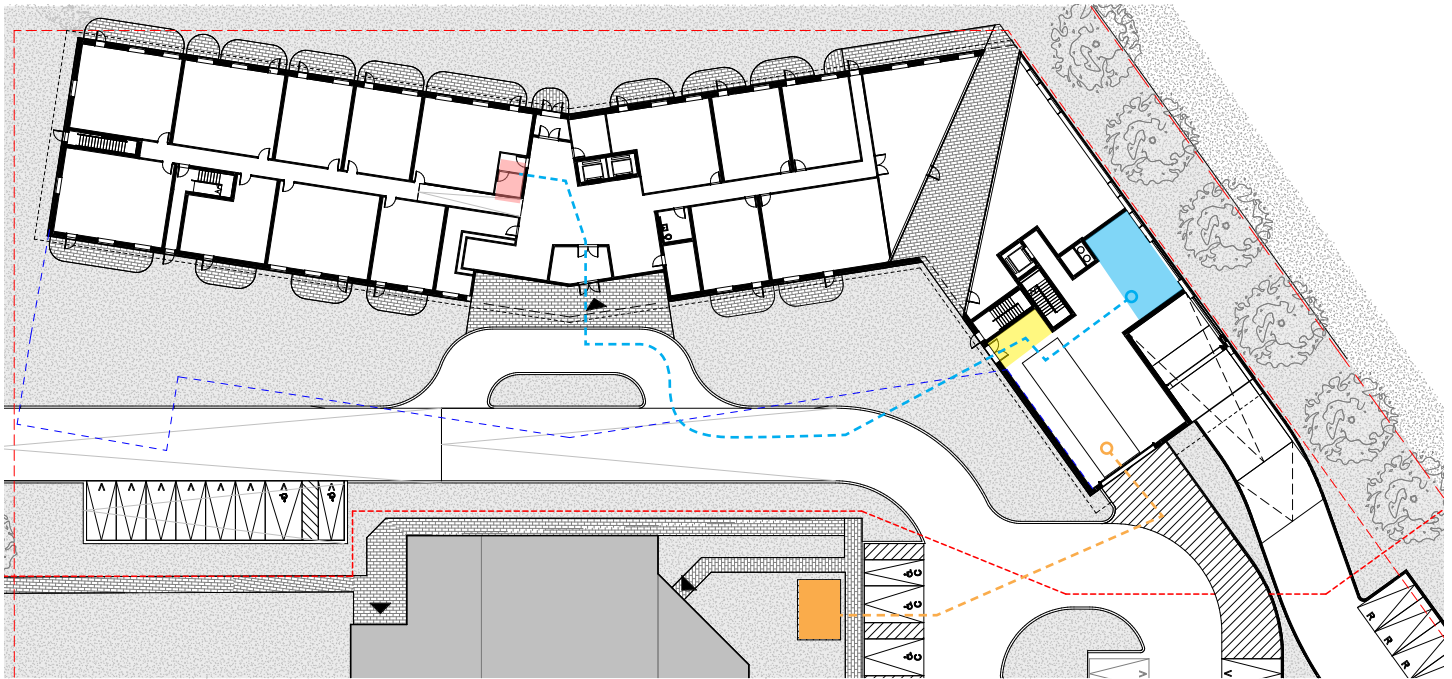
Ground floor residential waste disposal and storage. Building operations waste relocation route and main storage adjacent to loading bay. Church waste storage relocated to NE corner of church, with church waste moved to the main loading area ahead of collection days.
